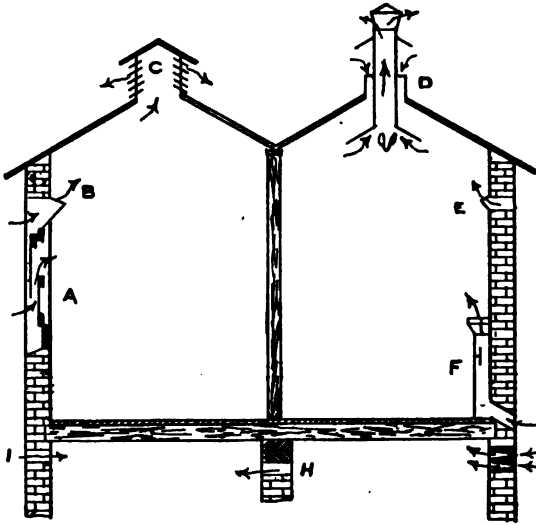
Diagrammatic sketch of various provisions for ventilation. A, Sash window with Hinckes-Bird's arrangement. B, Hopper sash light falling inward. C, Louvred outlets. D, McKinnell's ventilator. E, Sheringham's valve. F, Tobin's tube (showing valve open). G, Ellison's conical bricks. H and I, Grid ventilators below floor joists. (From "Hygiene and Public Health," by Drs. L. C. Parkes and H. R. Kenwood, London; H. K. Lewis, Philadelphia, Blakiston, 1911.)
